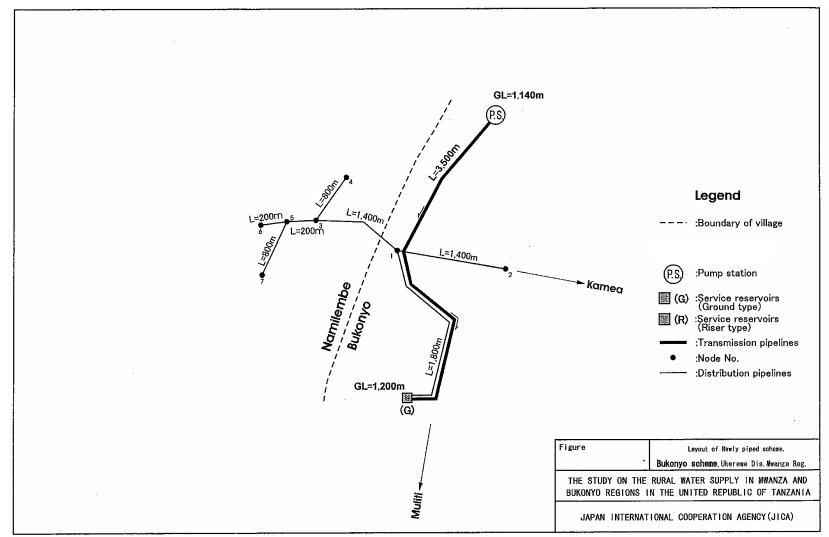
Layout of Newly Installed Piped Scheme (Bukonyo Scheme)
